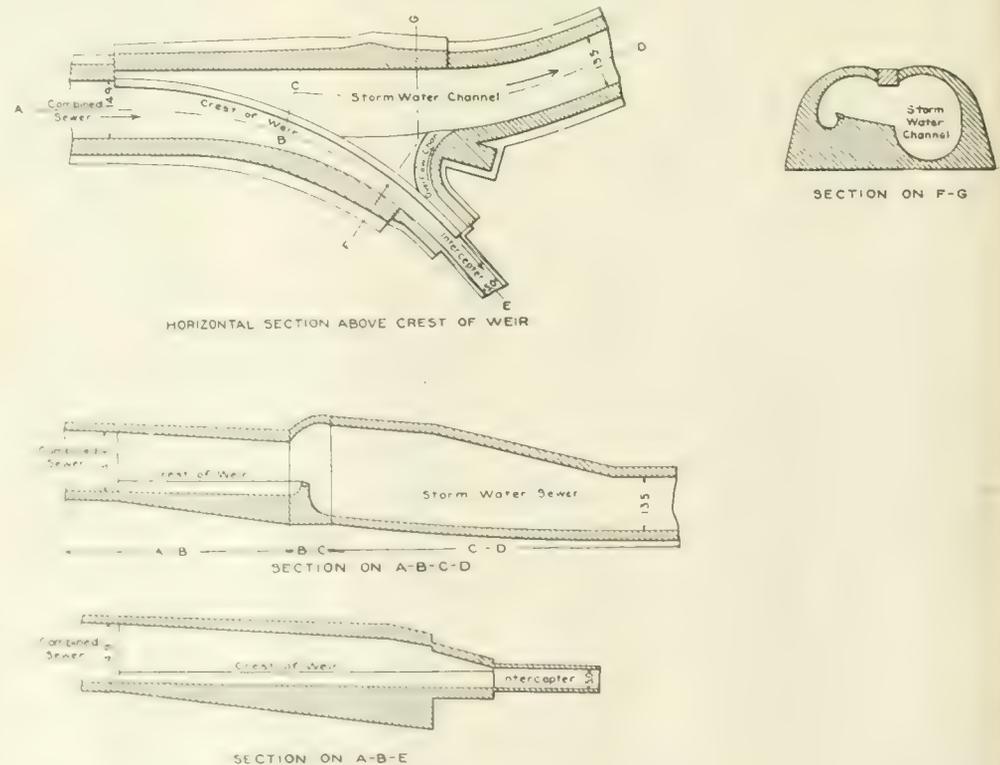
Details of Overfall Weir for Storm Water Overflow, Walworth Sewer, Cleveland, Ohio.
